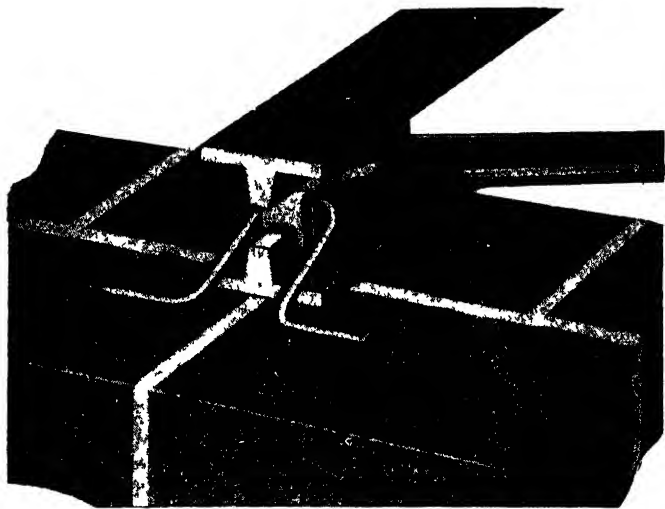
,680 —Open truss steel joist resting on masonry wall. Ends of every third joist resting on masonry walls should be anchored thereto by means of special wall anchors as illustrated
